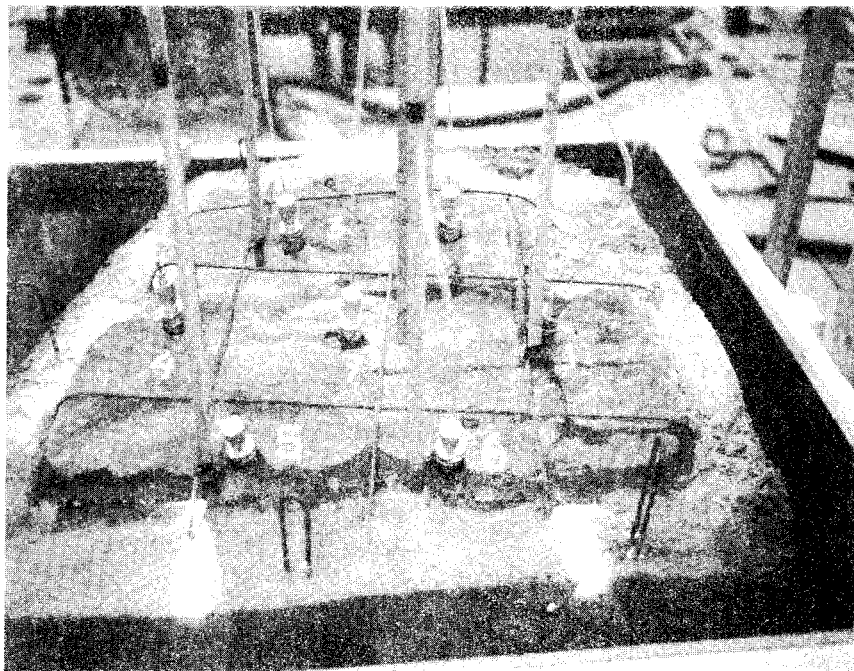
Top surface of the concrete-confined block with electrodes installed. Pipe connections of glass and plastic were used for permeability measurement.
